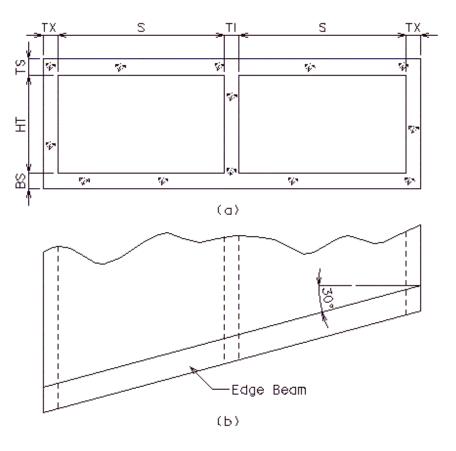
(a) Typical cross section of double box culvert (b) partial plan view of culvert showing edge beam
